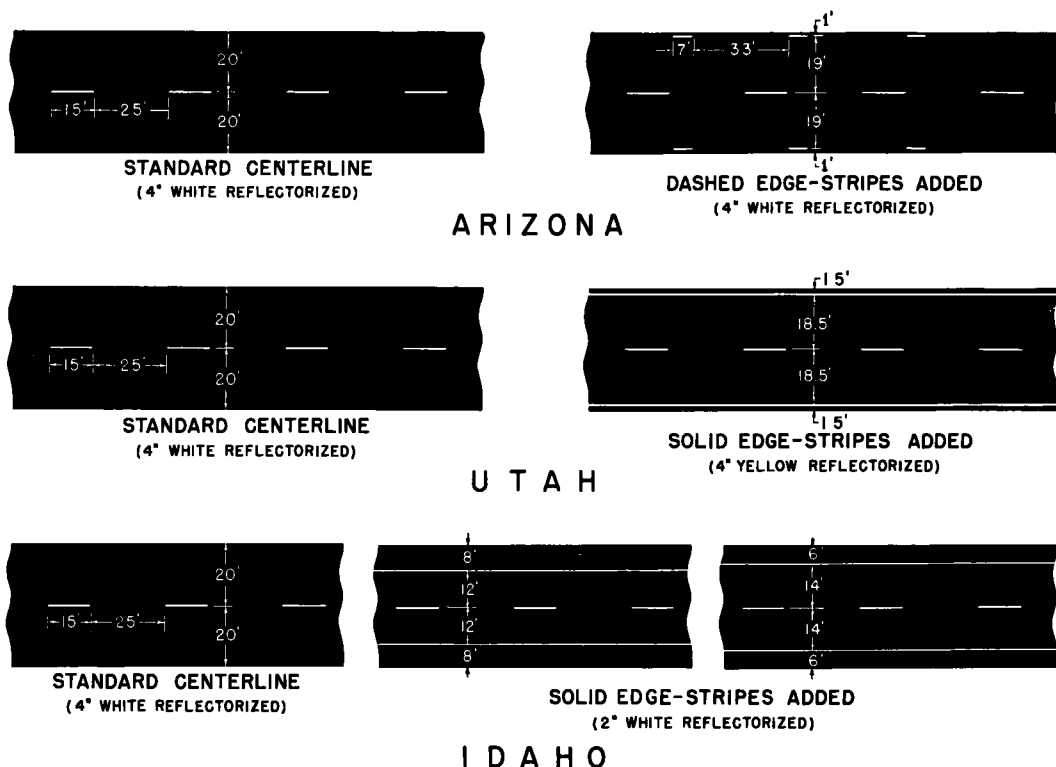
Edge striping on sections paved to their full shoulder width on rural 2-lane bituminous pavements.
